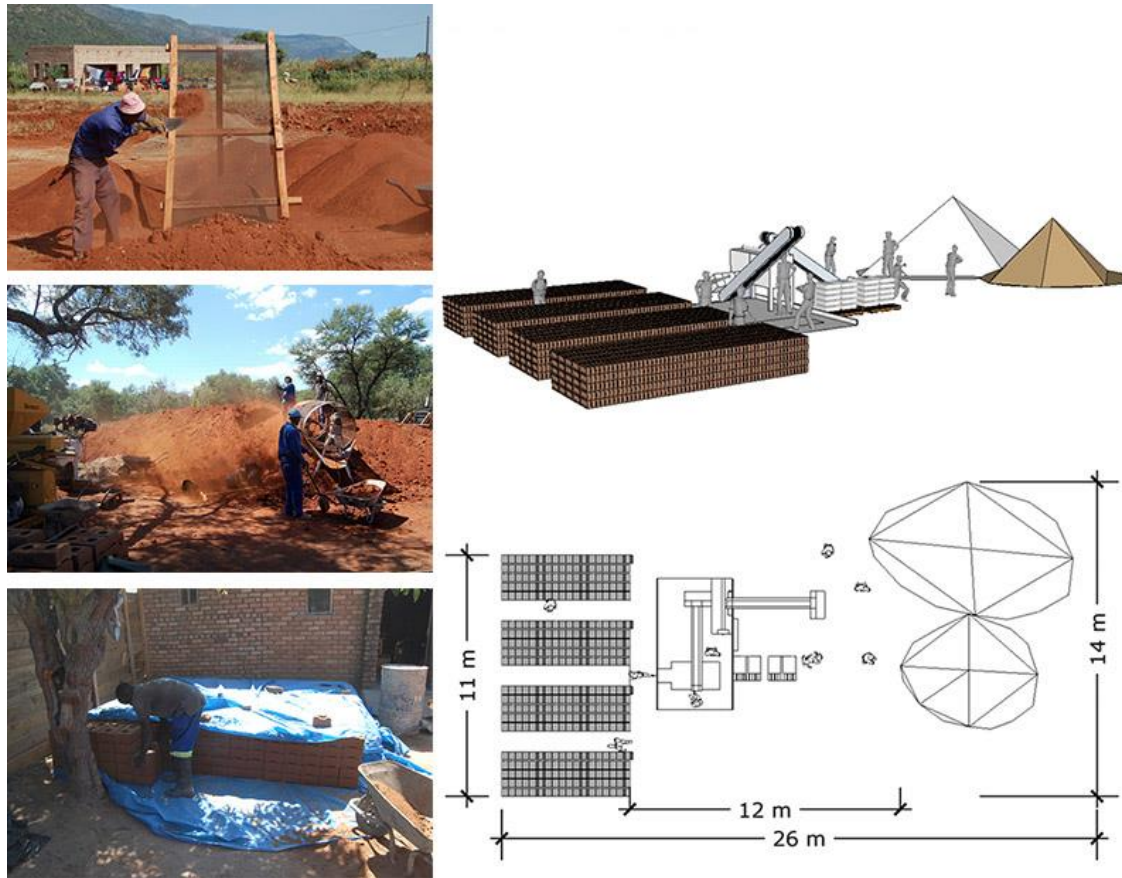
Block yard layout and CEB on-site production process (Source: Dwellearth)
